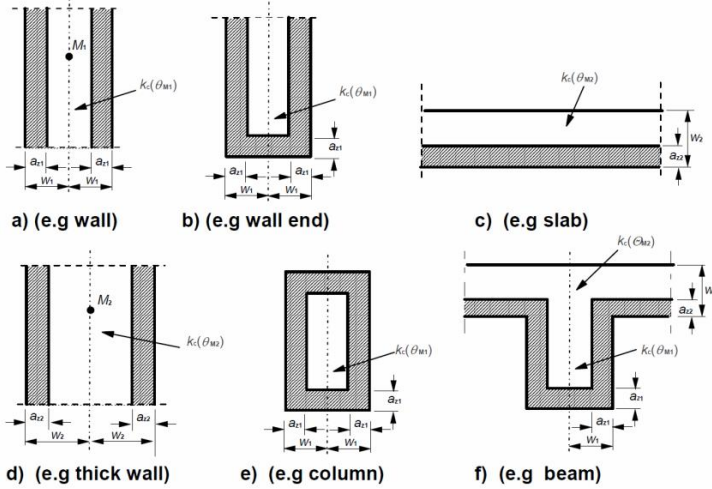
Reduction of strength and cross-section for sections exposed to fire
